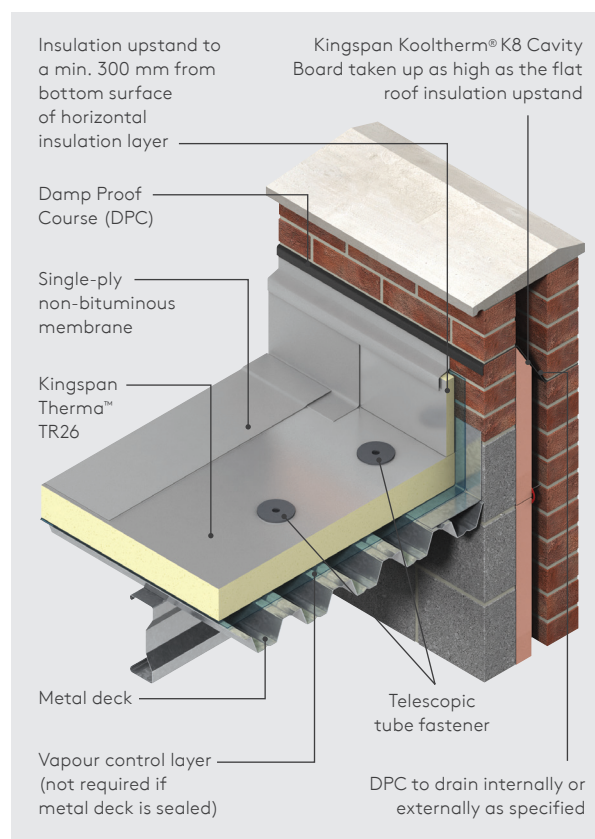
Kingspan Therma™ TR26 in a Metal Deck with No Ceiling.
